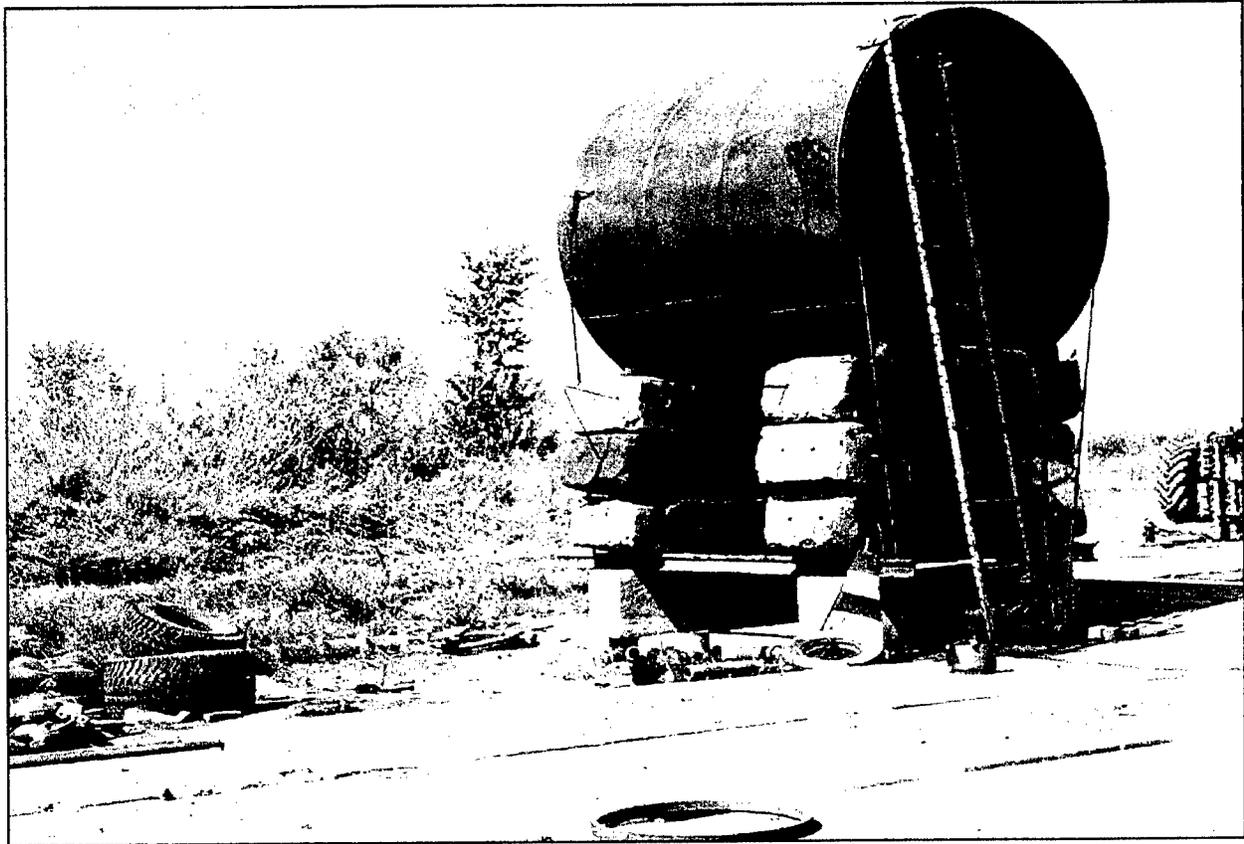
Salvaged sections of the "barbette" reinforced concrete walls used to support a water tank on a local farm. Note the salvaged concrete pads on the ground surface. Derzhavinsk.
